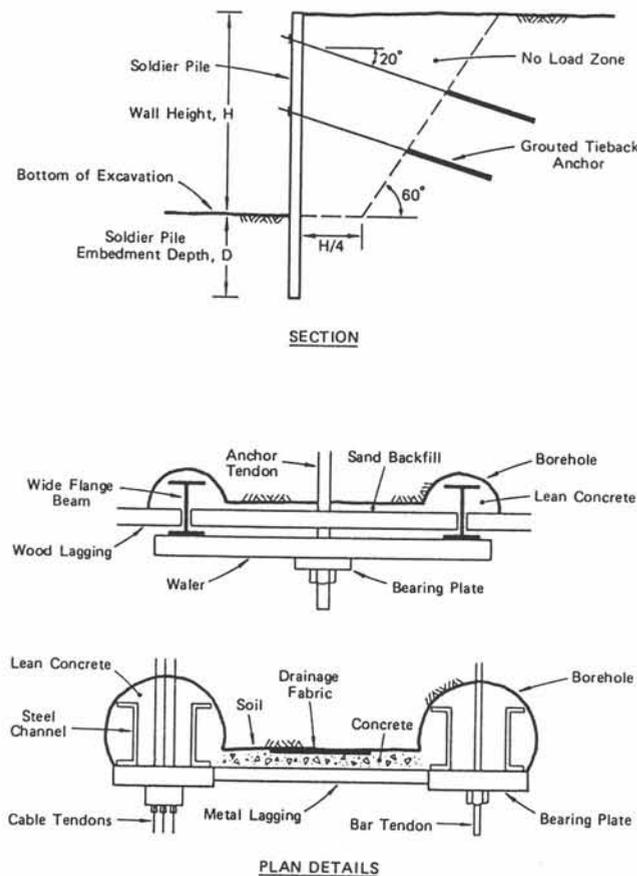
Detailed view of soldier pile-tieback anchor shoring walls as used in downtown Seattle high-rise building foundations.
